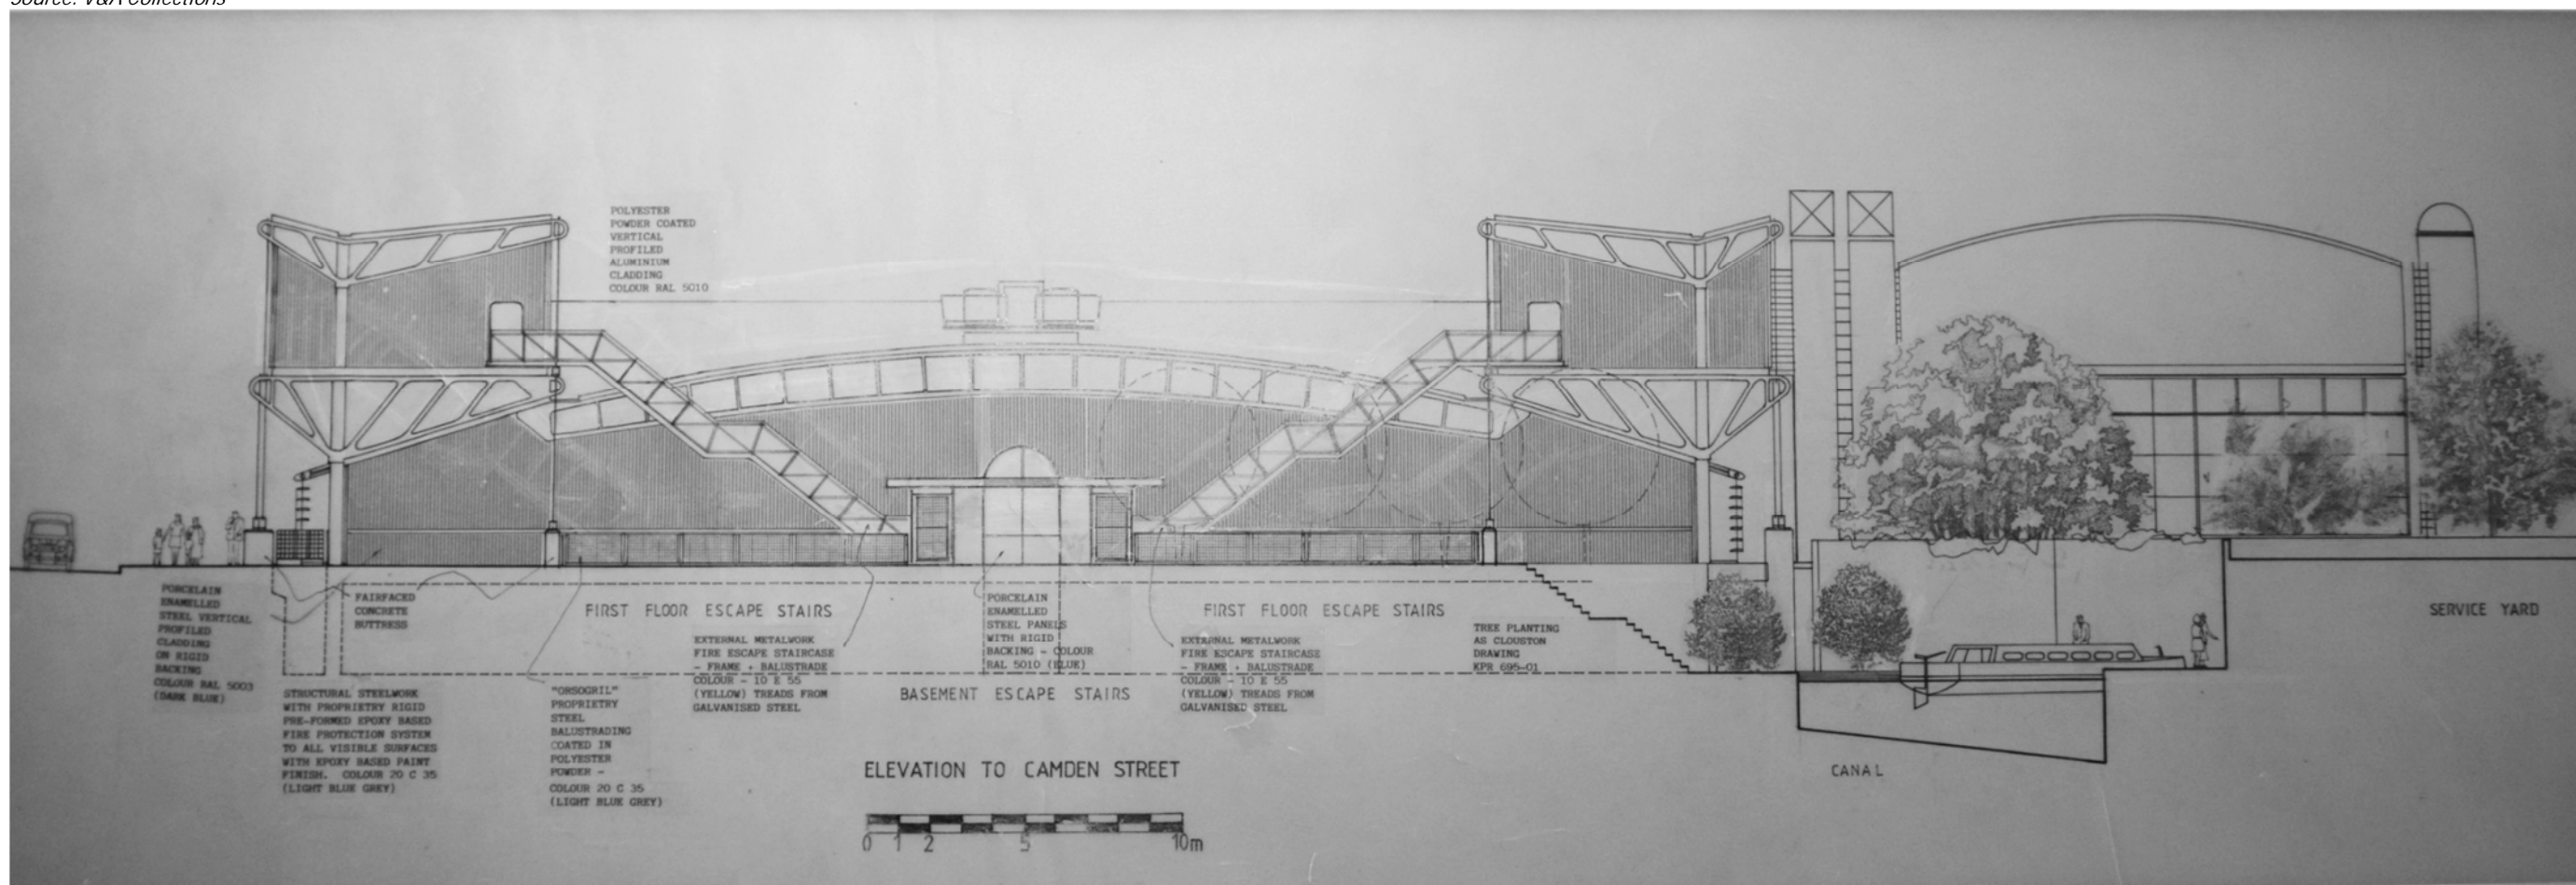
1988: Sainsbury's: Elevation to Camden Street
